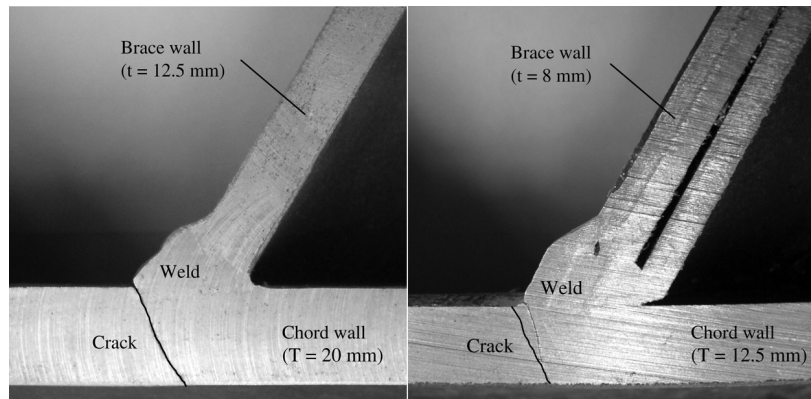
Cracks through chord thickness: joints S24 (left) and S31 (right) at joint location 1.
